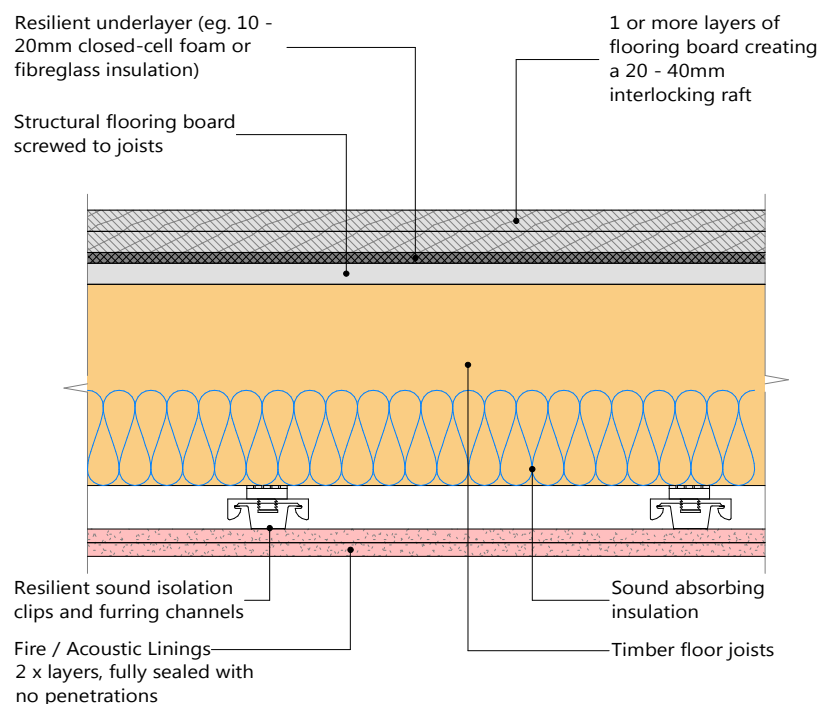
Floating floor made from flooring panels on thick resilient underlayment.
